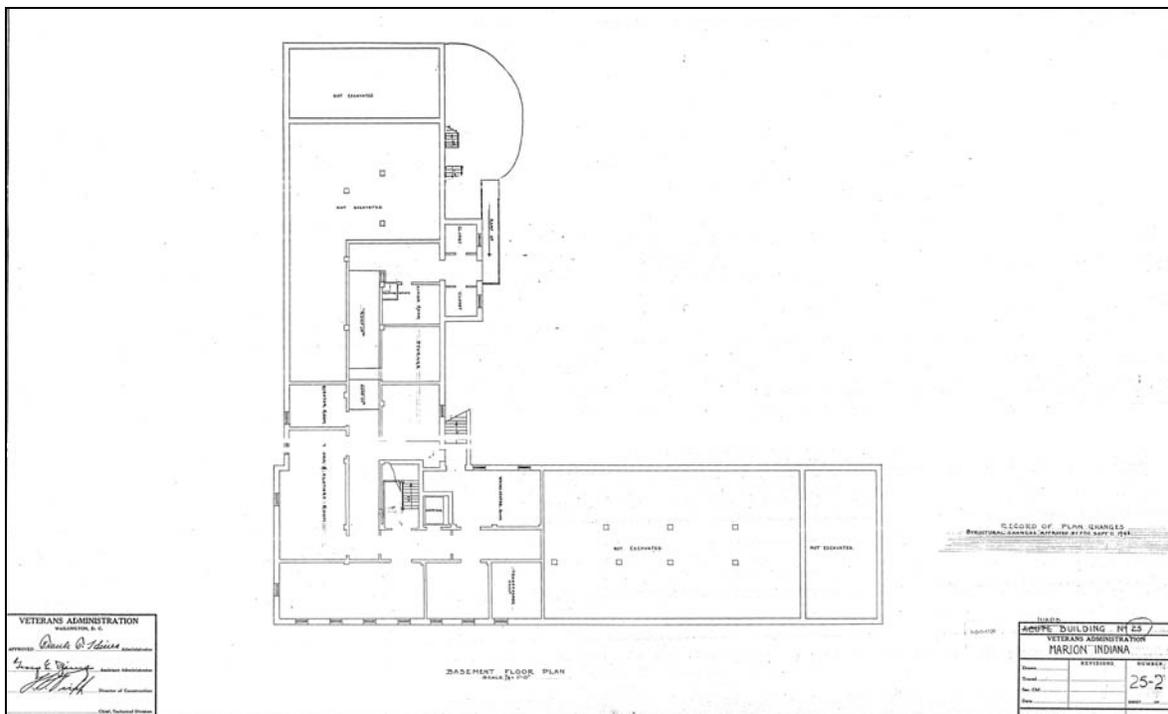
Basement Floor Plan, Building No. 25, c. 1943
